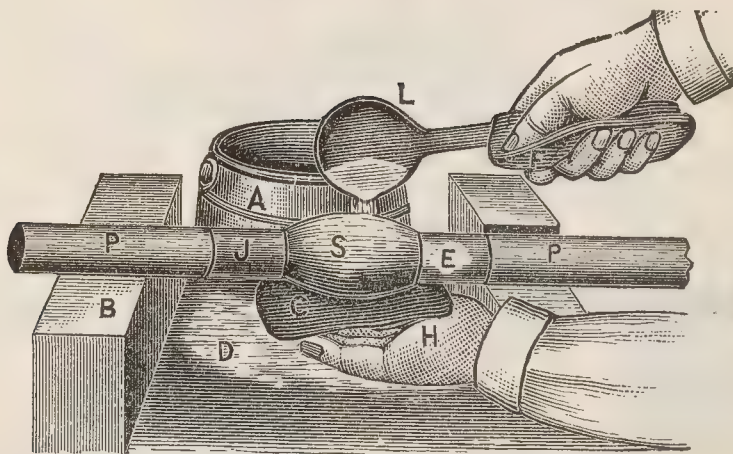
,452.—Wiping a horizontal joint; one hand method. A, melting pot; B, brick support; C, cloth; D, waste solder; E, J, soil; S, solder; H, hand; PP, pipe end to be joined.
